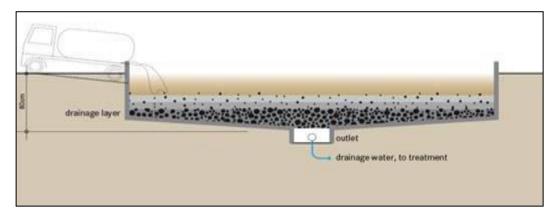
10 Schematic overview of an unplanted sludge drying bed. (Source: Tilley *et al.*, 2014)
